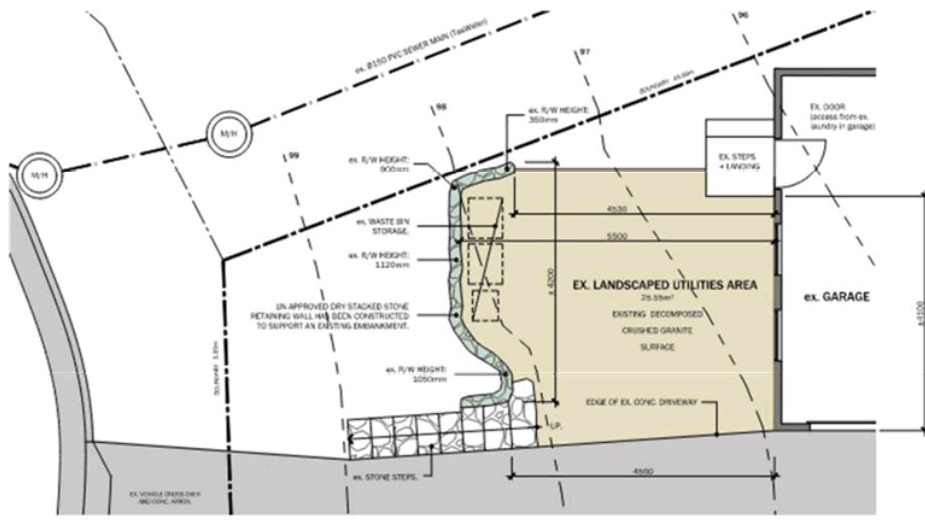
site plan. Note: Area H (deck extension) was approved under Planning Assessment Enquiry - PAE-23-51
